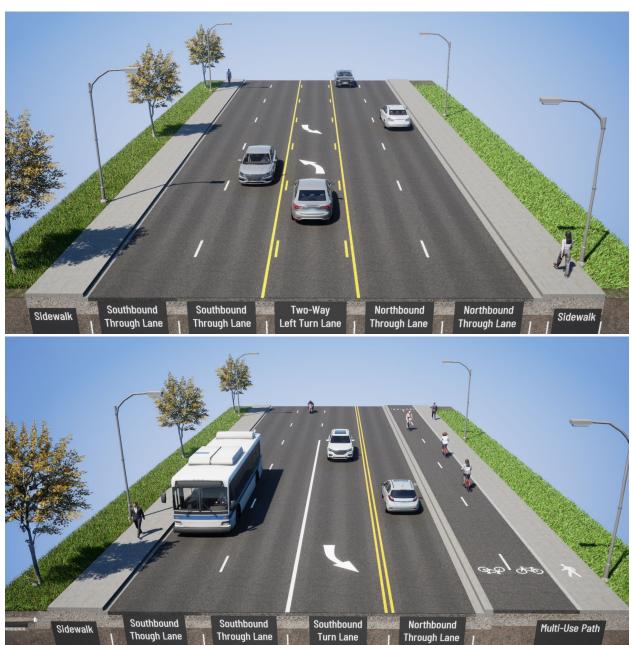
Existing Segment 4 Typical Cross Section (top) and Proposed Segment 4 Typical Cross Section (bottom)
